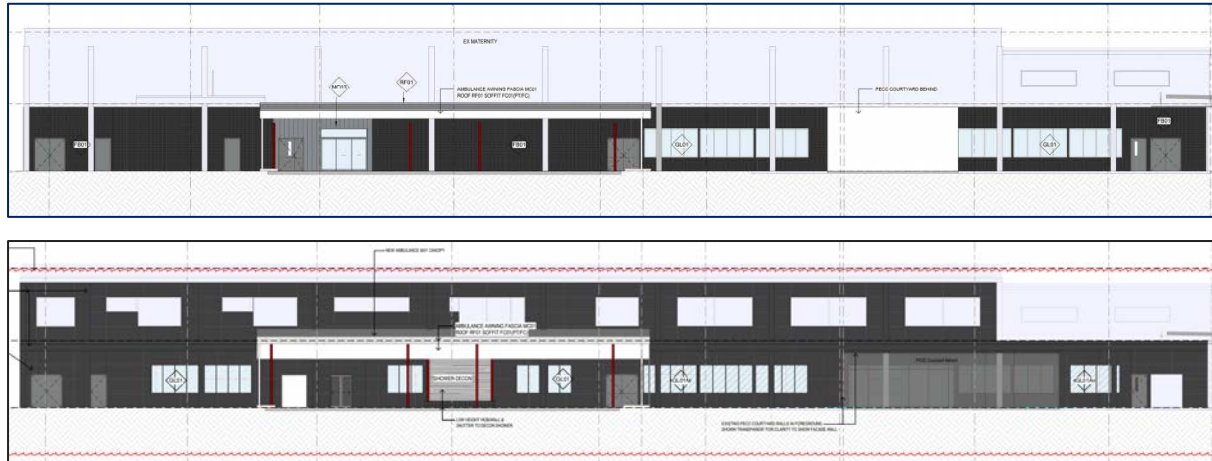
| Approved southern elevation (above) and proposed southern elevation (below) (Source: SSD 8647 Approved Plans and Applicant’s Modification Report)
